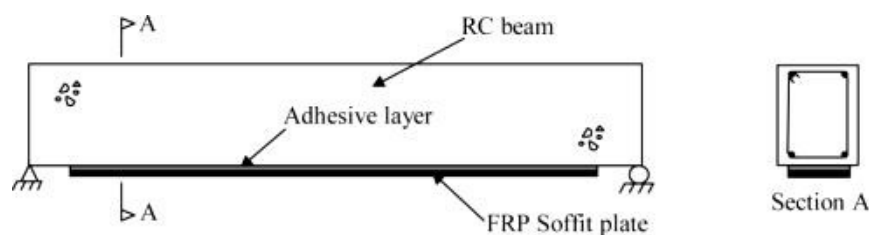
RC beam bonded with soffit FRP plate (Smith and Teng, 2002)
